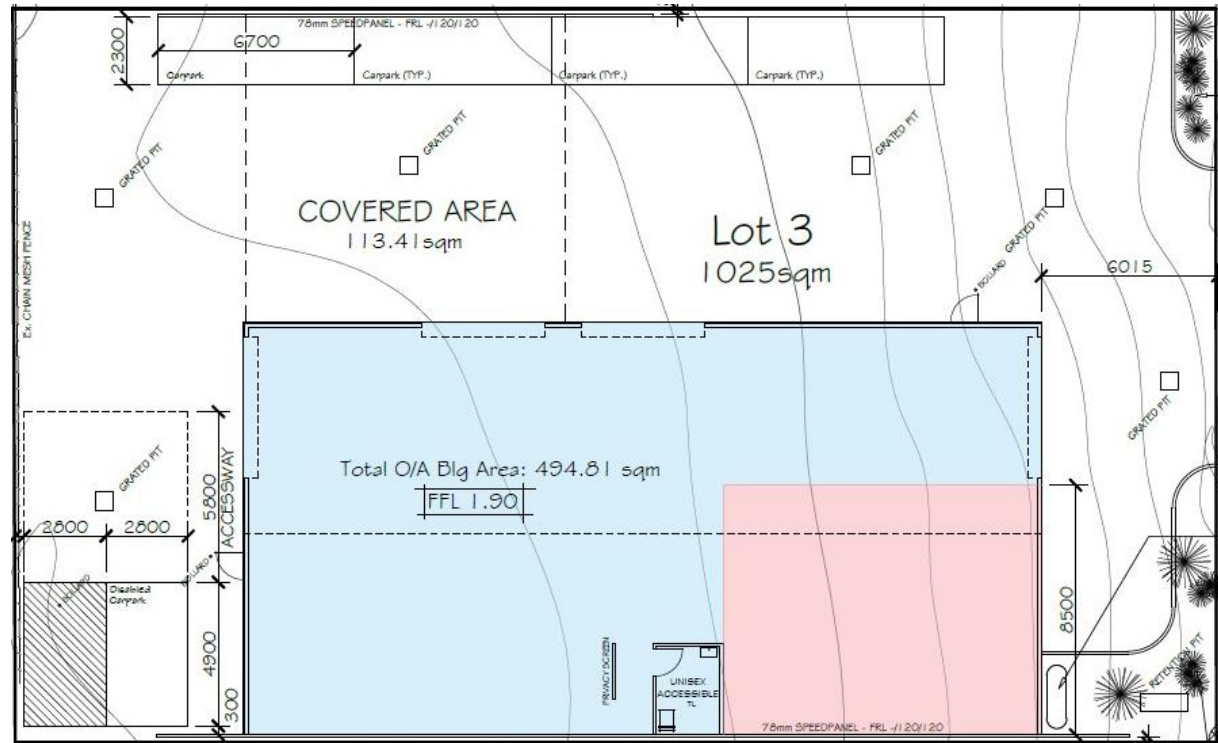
Proposed Site Plan – 3875 Design and Drafting
